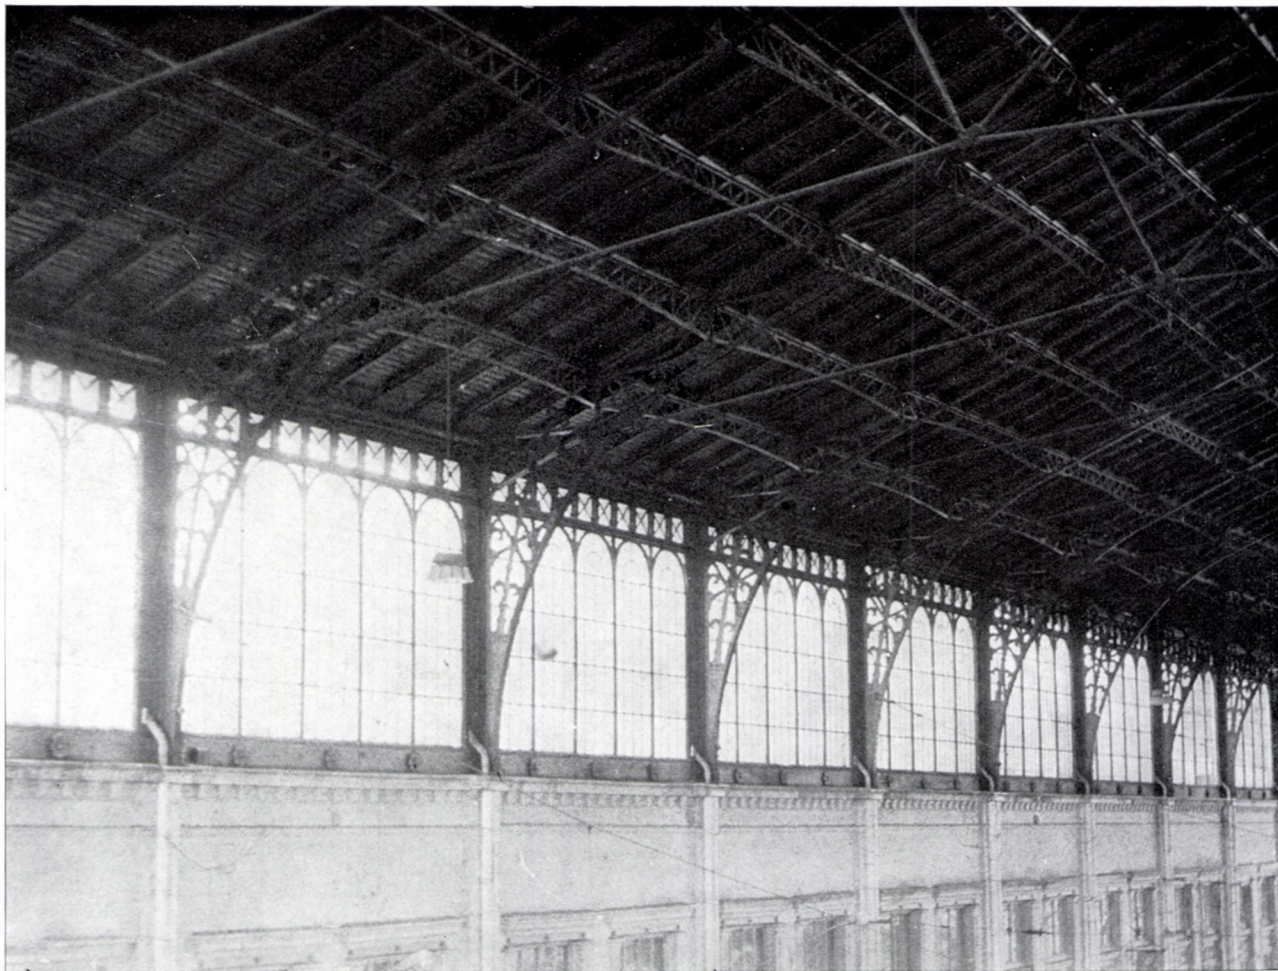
The roofing system: lattice purlins between the principal rafters (pre-reconstruction photo)
